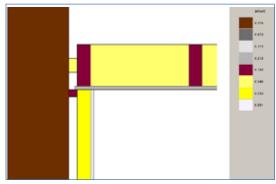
A wall-ceiling junction after the application of insulation. The insulation should be kept at least 30mm from the existing solid wall. Steps should be taken to prevent cold air from the loft space leaking into the space behind the insulation and plasterboard. Timber battens adjacent to the ceiling-wall junction, as shown, can help to prevent this, as can tucking insulation between the joist and the existing wall.
